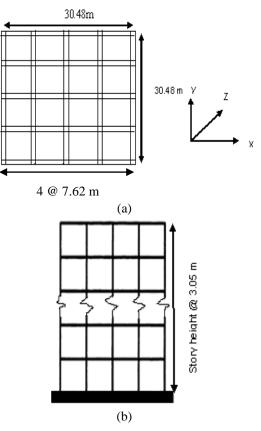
Model of FB or BI multi-storied buildings: (a) Plan View, (b) Elevation
